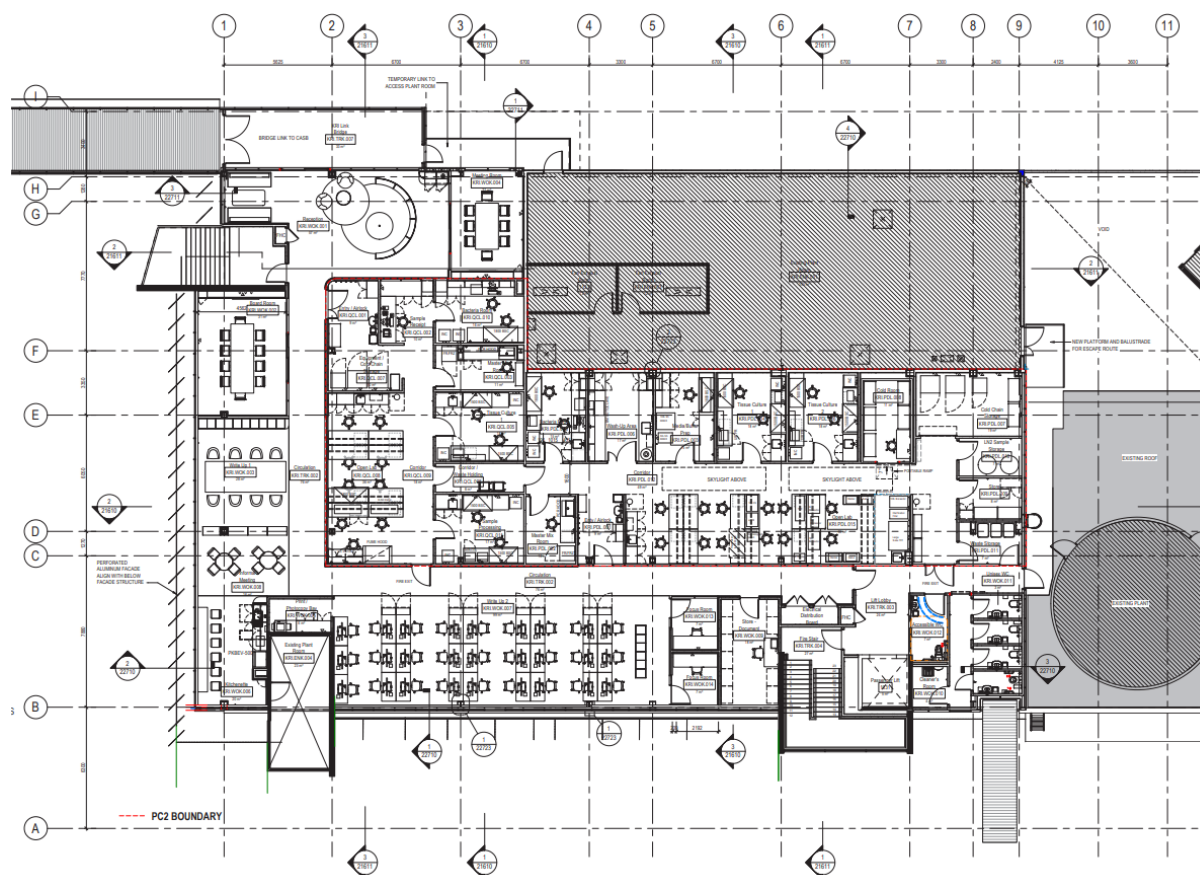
Proposed KR Level 4 Plan (VVMF 2a fit out) (Source: HDR)
